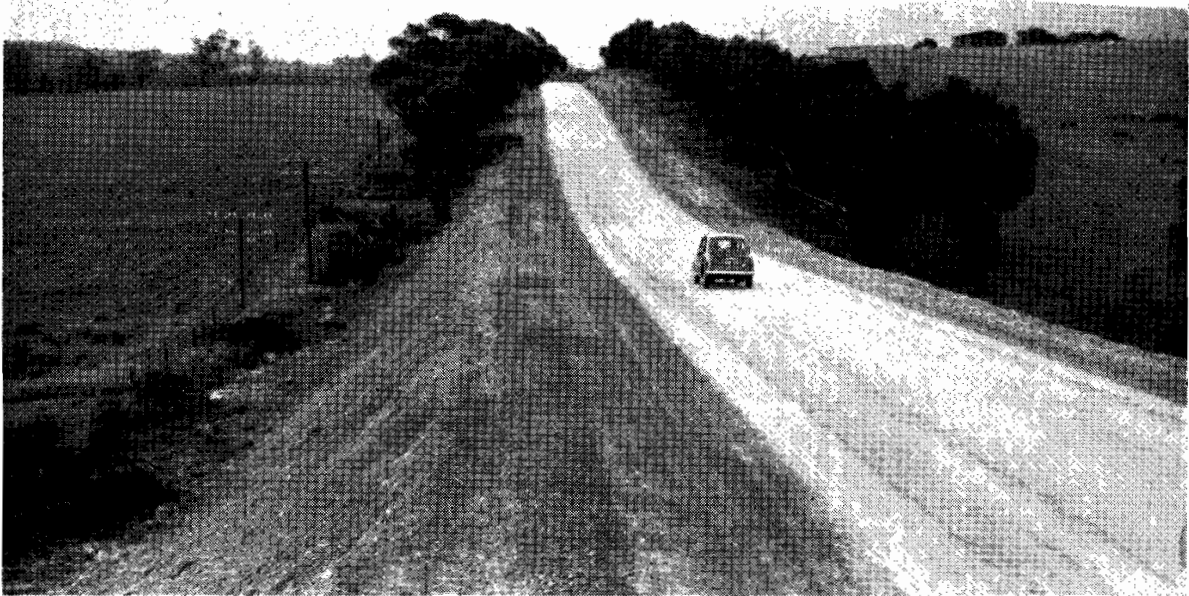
Maroondah Highway, showing same section after reconstruction.
